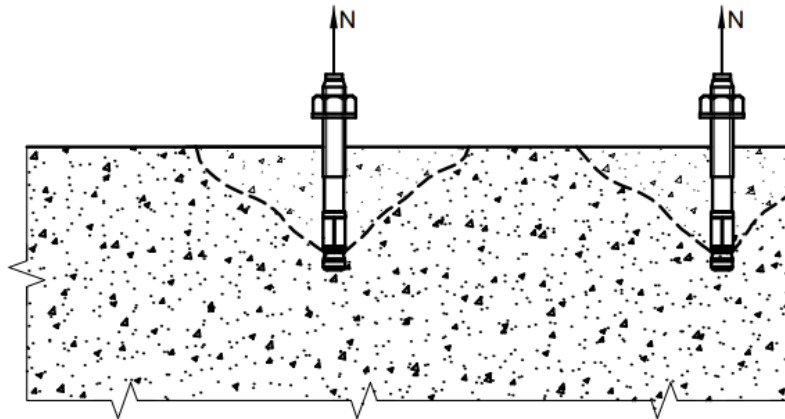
TYPICAL CONCRETE CONE FAILURE
